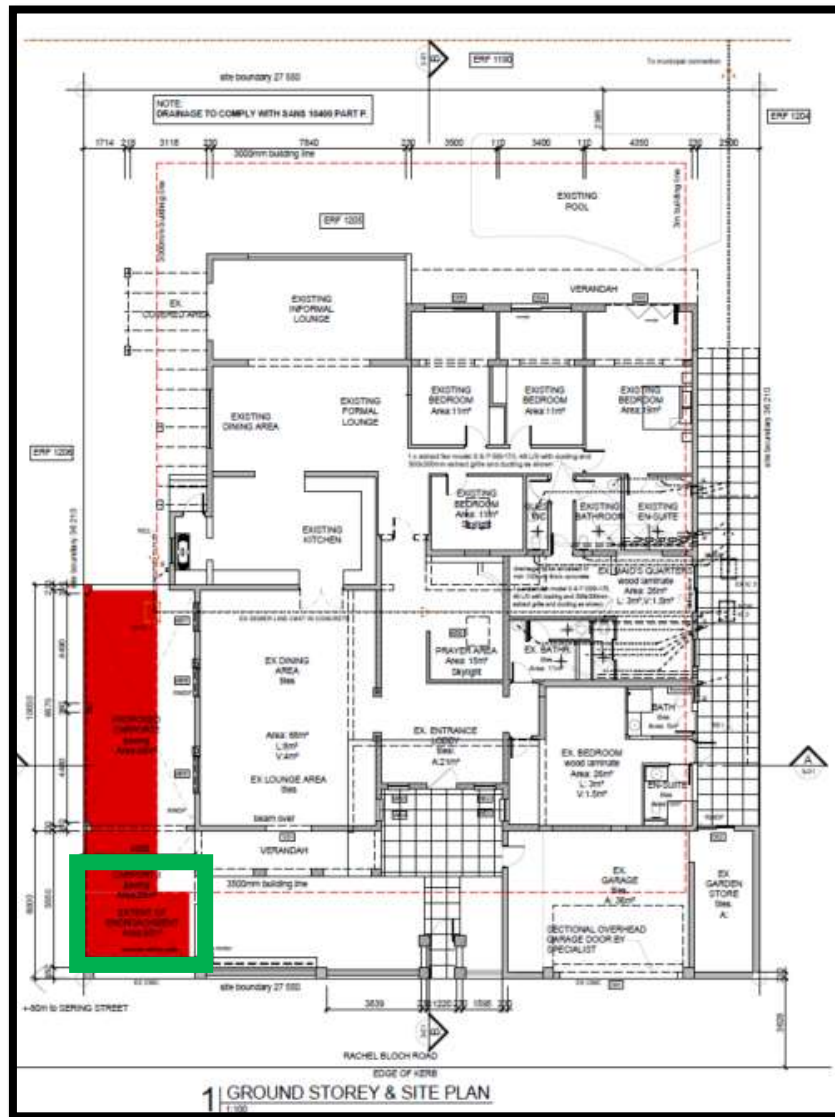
Site Plan showing the portion of the carport encroaching the Street building line
